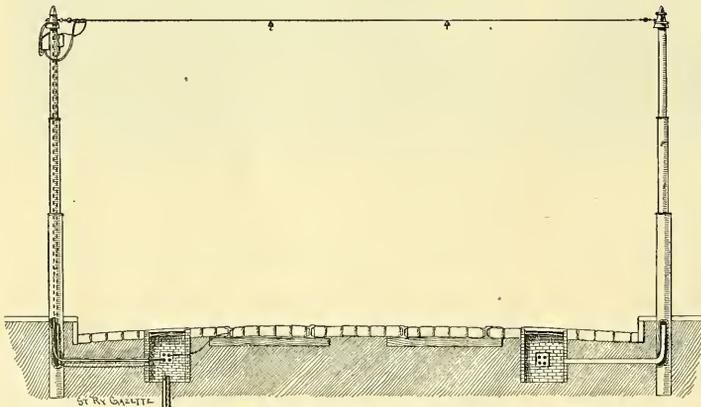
SECTION OF ROADBED SHOWING MANHOLES AND FEED CONNECTIONS.
